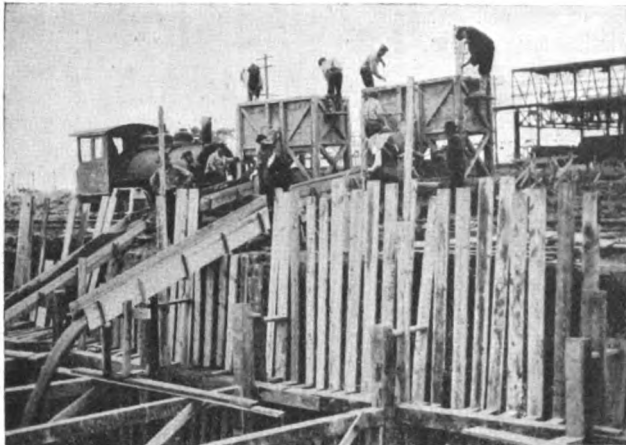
TRANSPORT OF MIXED CONCRETE BY TRUCK.
